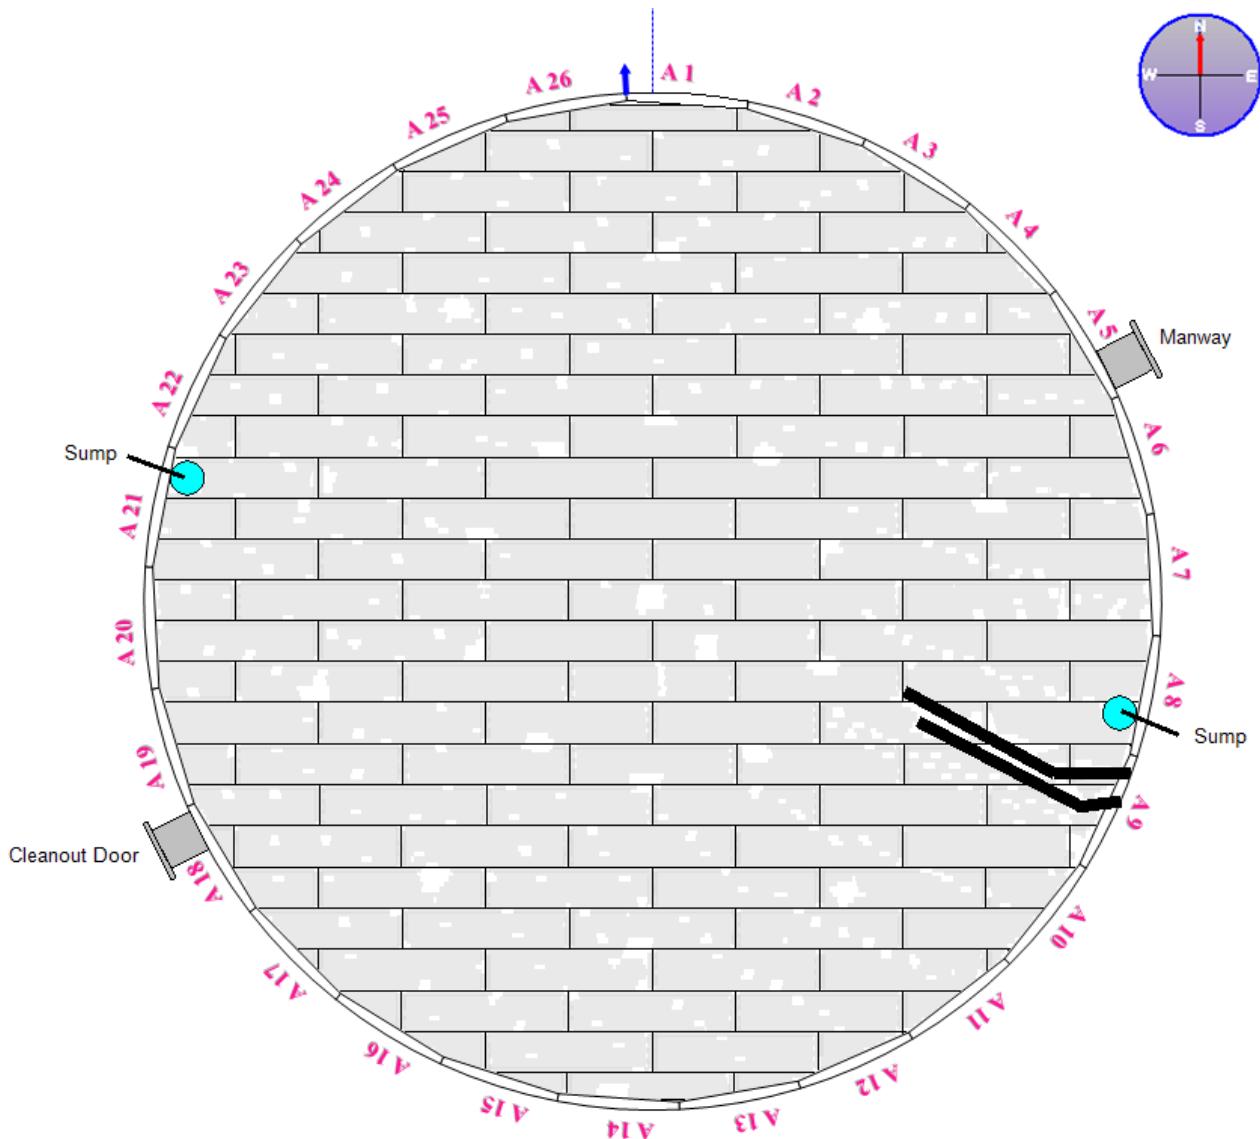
Tank drawing showing internal piping, roof support, man ways & North direction.
